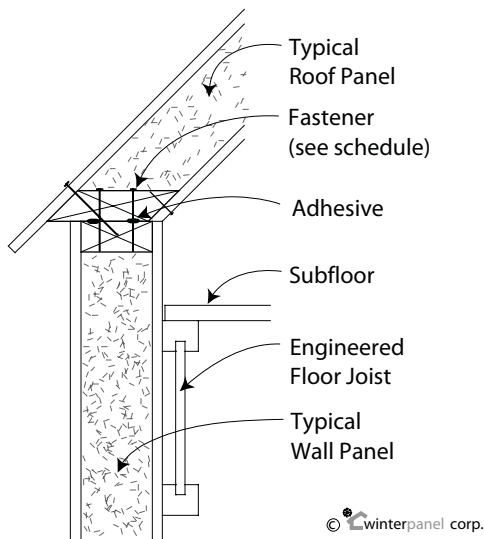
Installing Edge Roof Panel—No Overhang or Flush at Gable. Apply adhesive and nail roof panel to the wall panel as shown.
